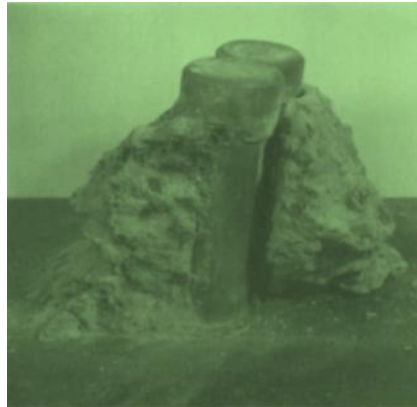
Pullout concrete failure of welded studs (Oehlers and Bradford 1995)
